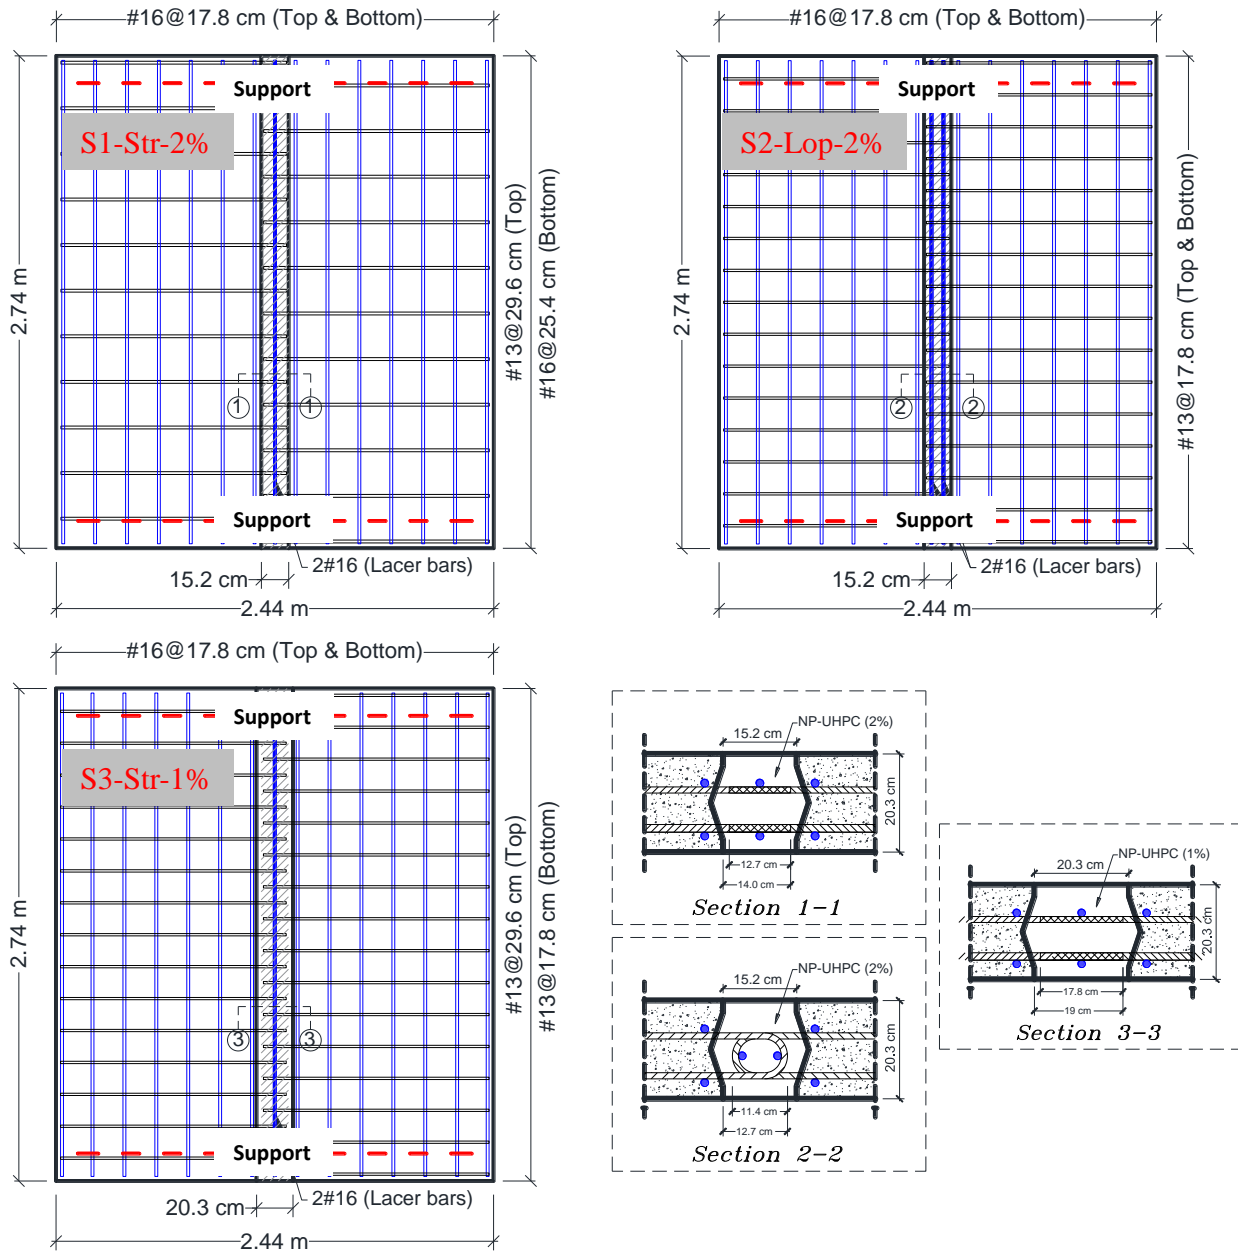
Overall dimensions and structural design details of the test specimens.
